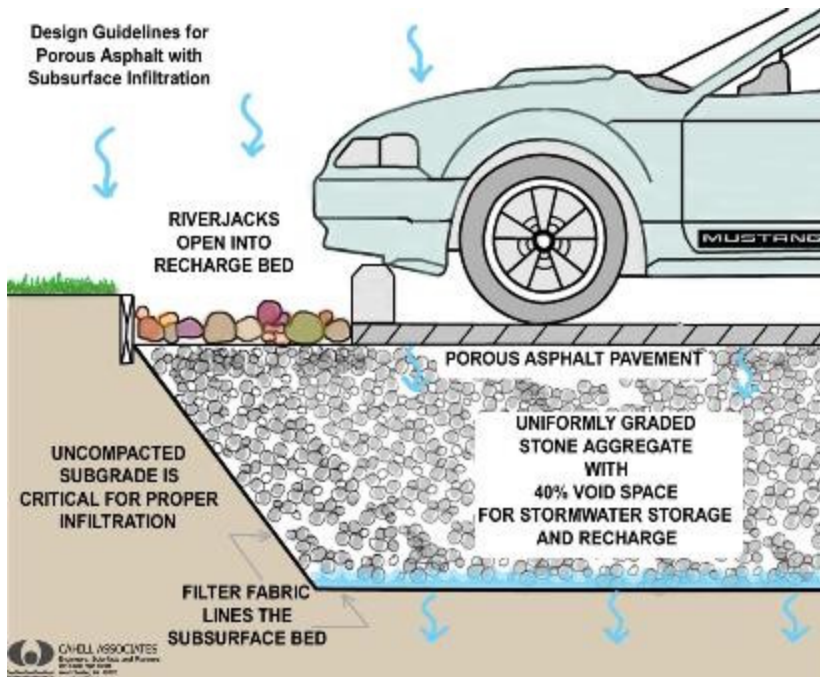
Typical Section of Porous Pavement with Groundwater Recharge Design
